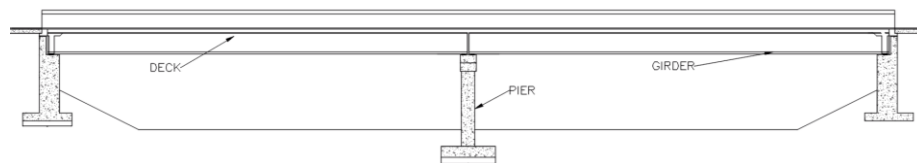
Schematic illustration of a multi-girder two-span bridge.
